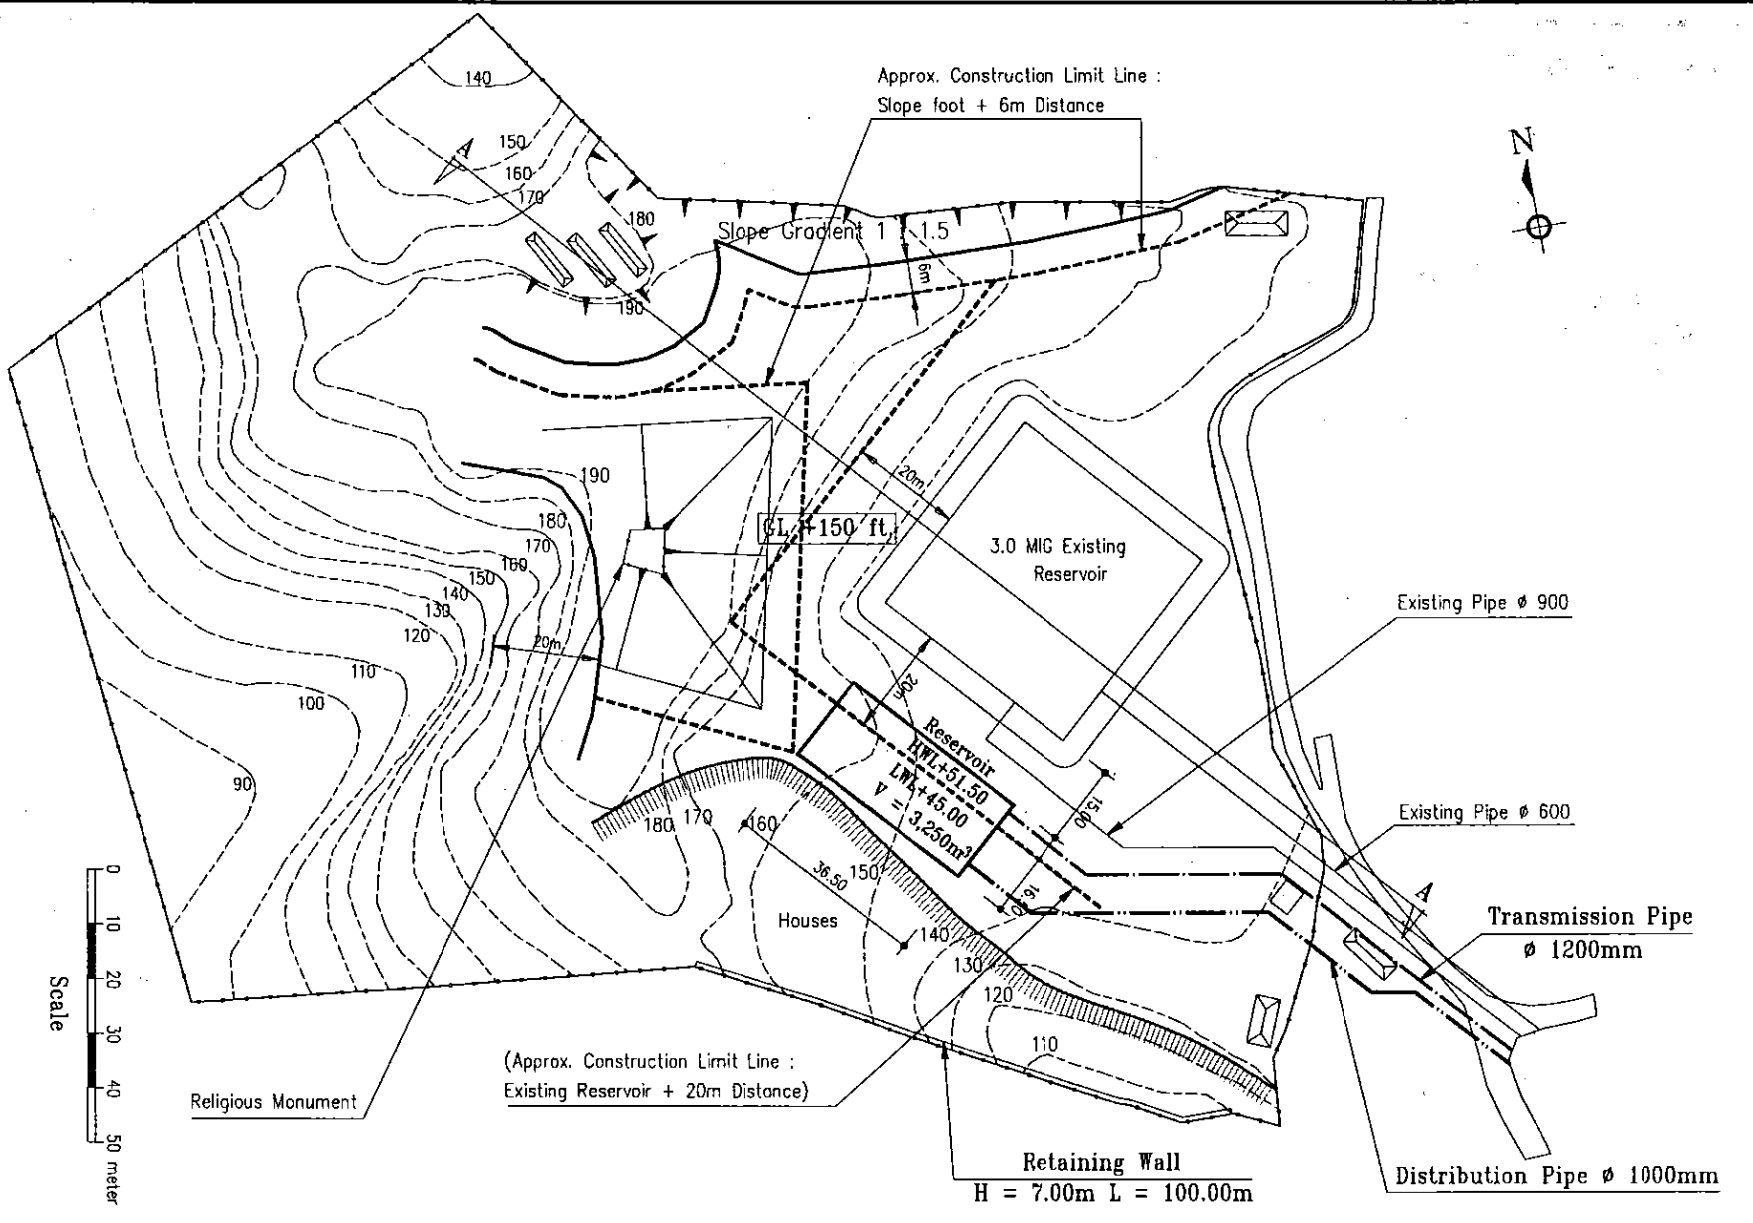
FUTURE LAYOUT OF BATTAIL HILL RESERVOIR
